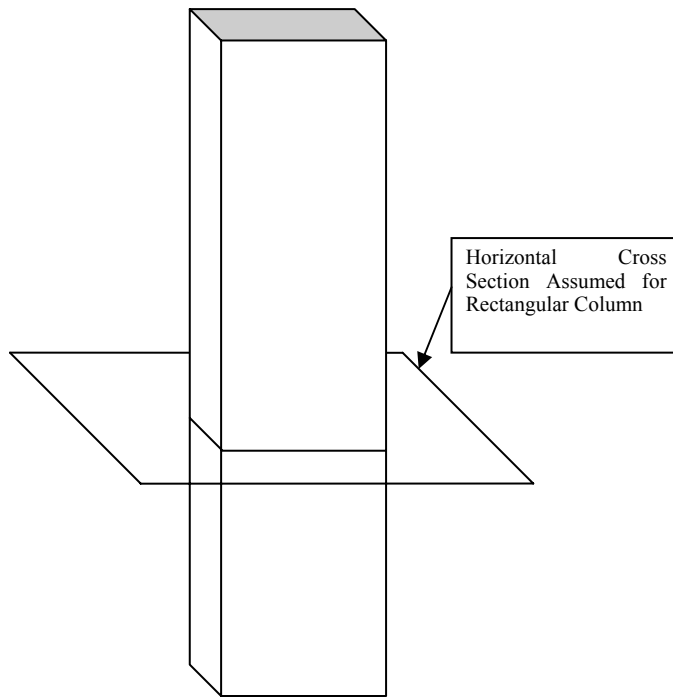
Horizontal cross-section of rectangular column assumed in ConcreteWorks
